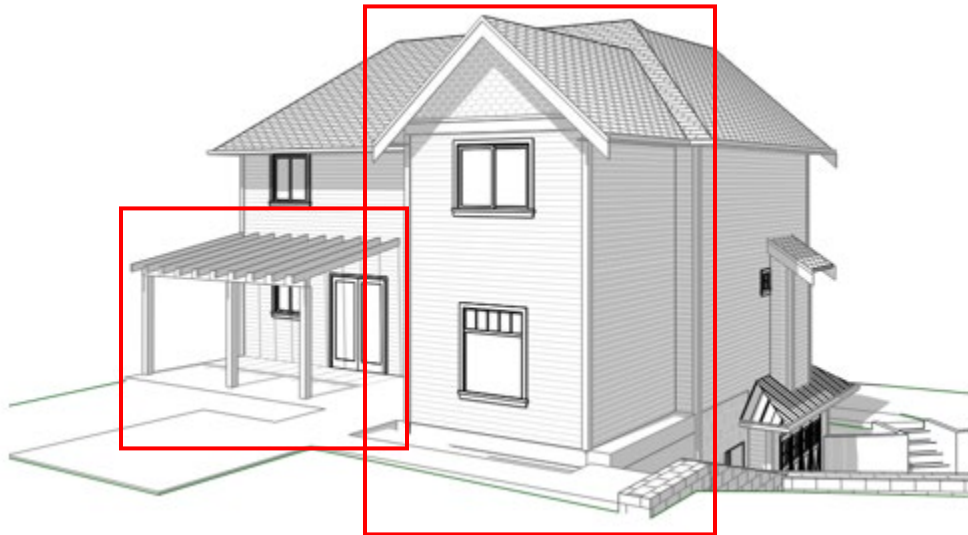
Proposed Addition and Alteration to the Existing Single-Family Dwelling
